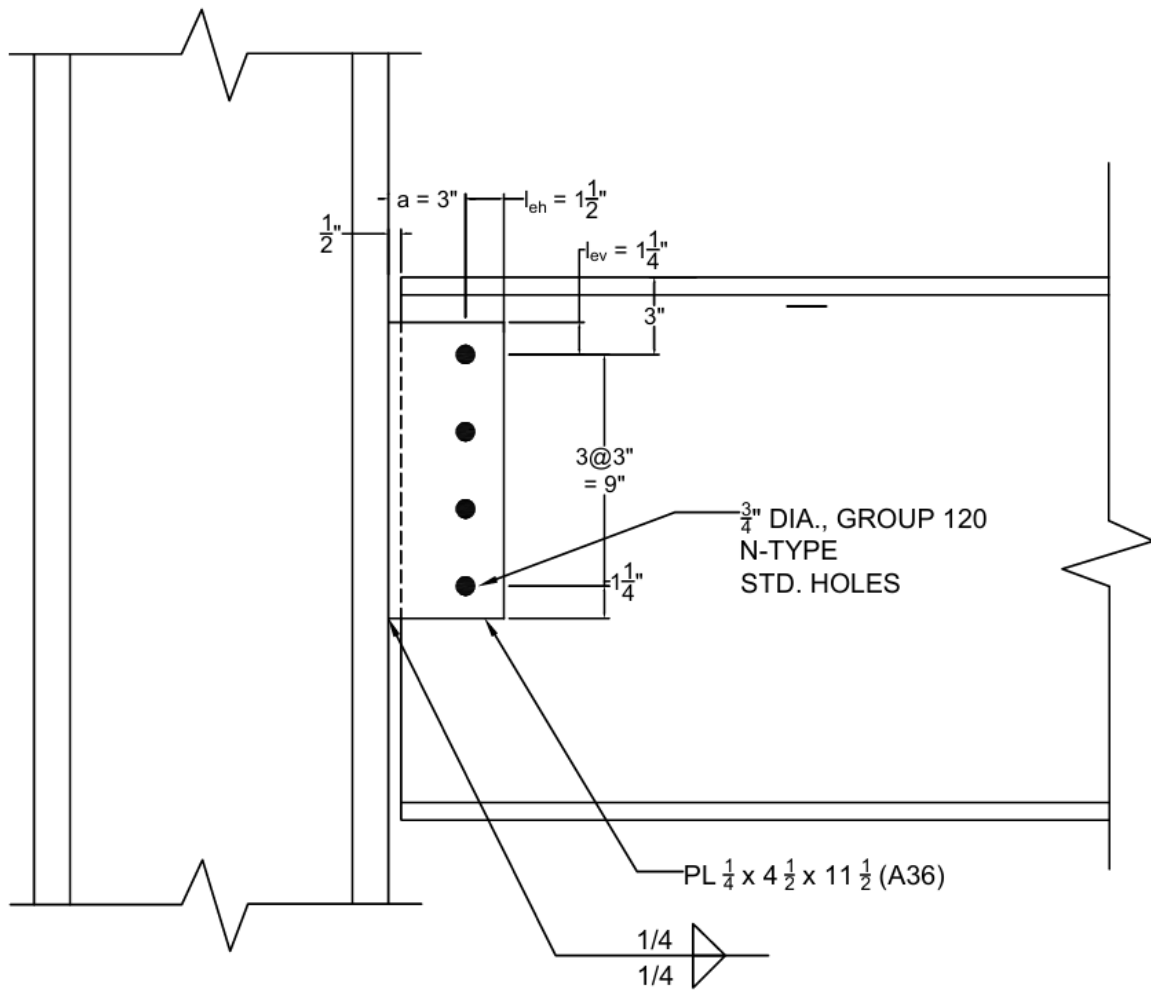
Beam to Column Design (G1 to C1 on third floor)
